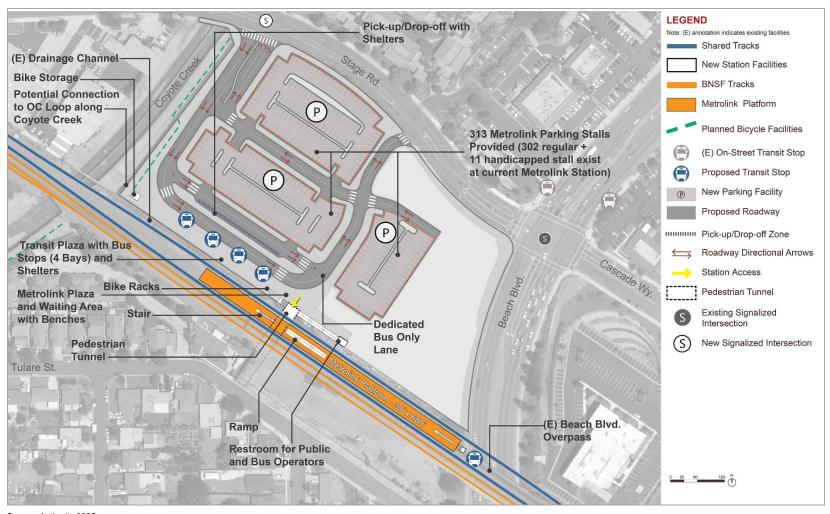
Proposed Relocated Buena Park Metrolink Station
